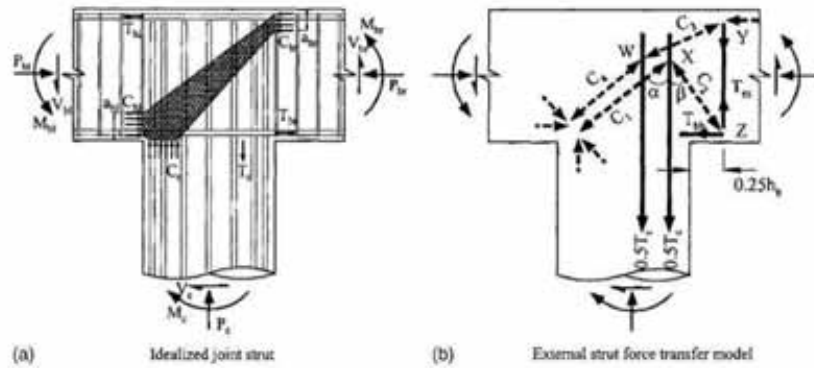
Strut-and-Tie model for pre-stressed T joints of precast concrete bridges [127].
